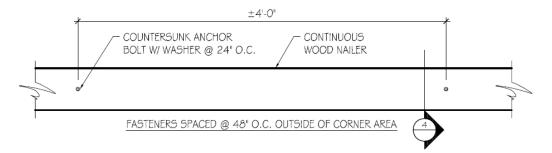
B - TYPICAL ROOF EDGE WOOD BLOCKING - THROUGH BOLT ANCHORAGE
